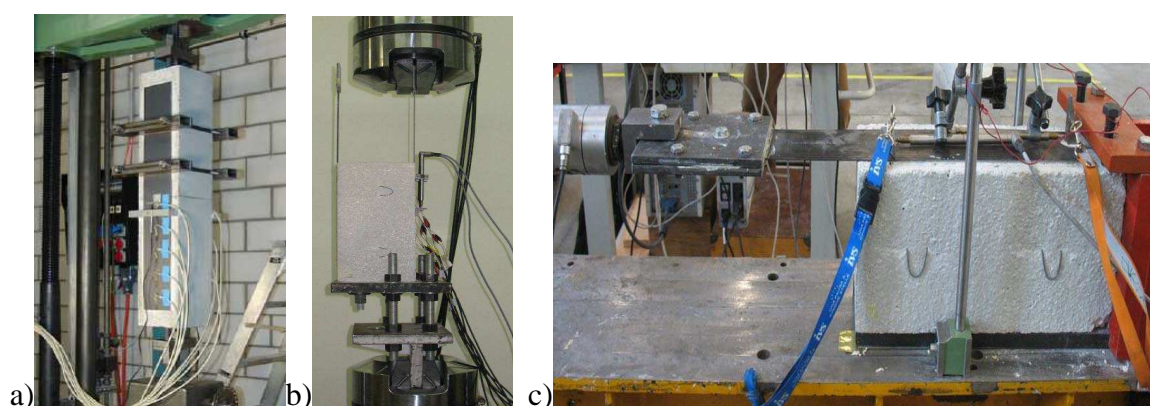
Specimen details a) DB test b) SB test type A c) SB test type B
